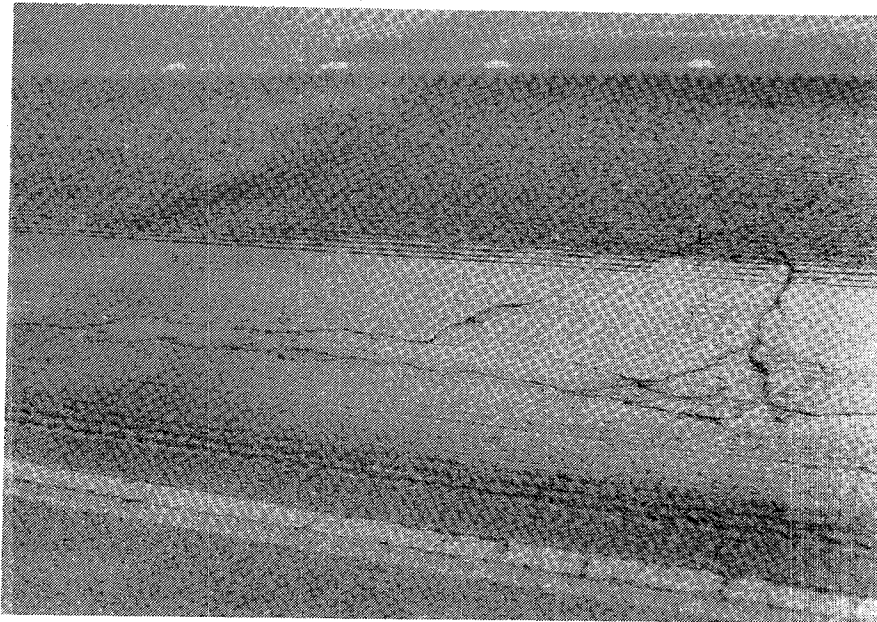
Illustration of fatigue cracking distress for flexible pavement with cement treated base (FLEX-13, California).
